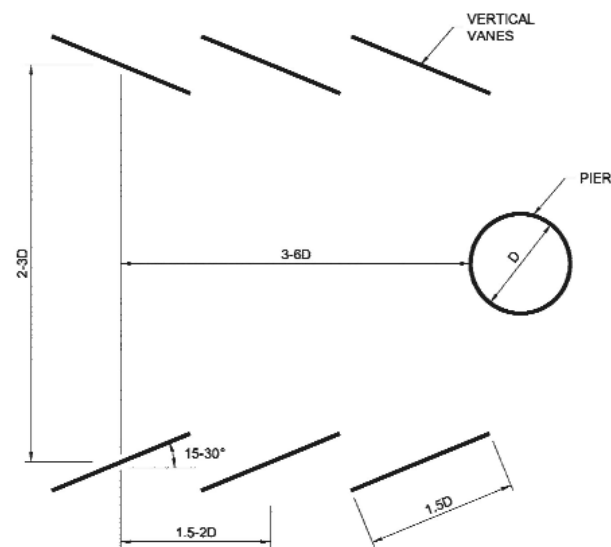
Indicative layout of vanes. The dimensions given show typical the range of dimensions tested in the laboratory
